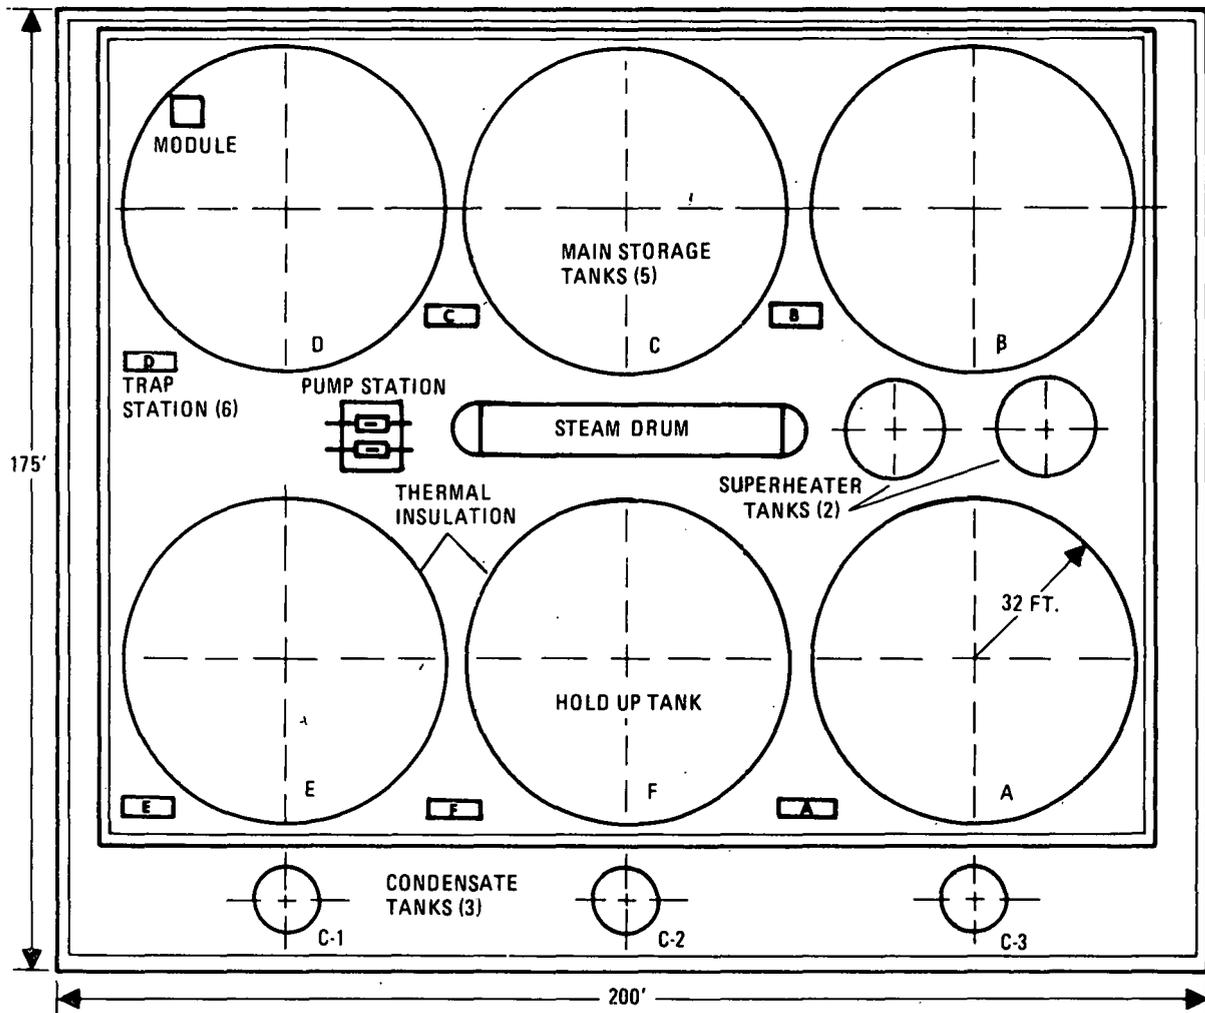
Pilot Plant Arrangement - Thermal Storage
